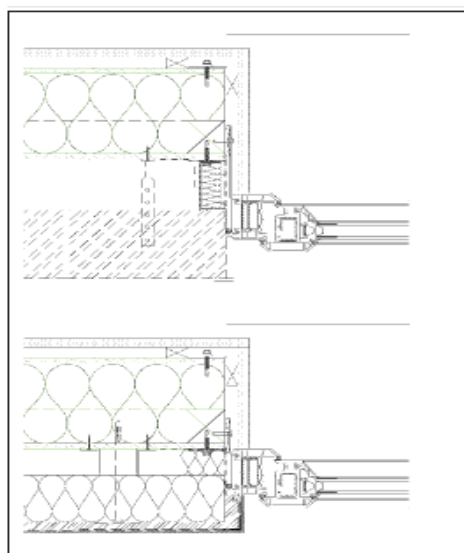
Typical window fixing detail Fig. 11 Infill panel head & foot detail
